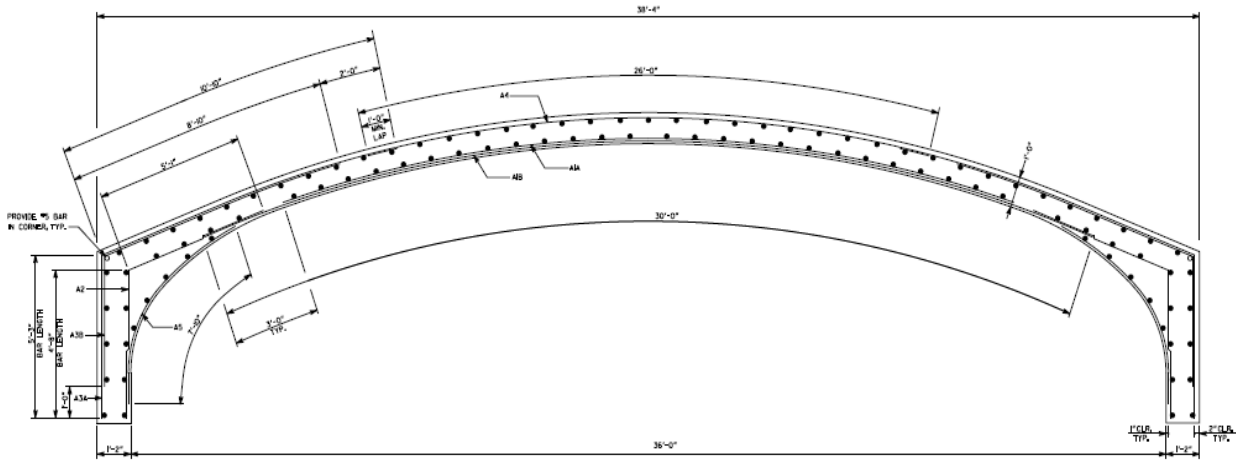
Laboratory Test Specimen – 36 ft Clear Span Section
